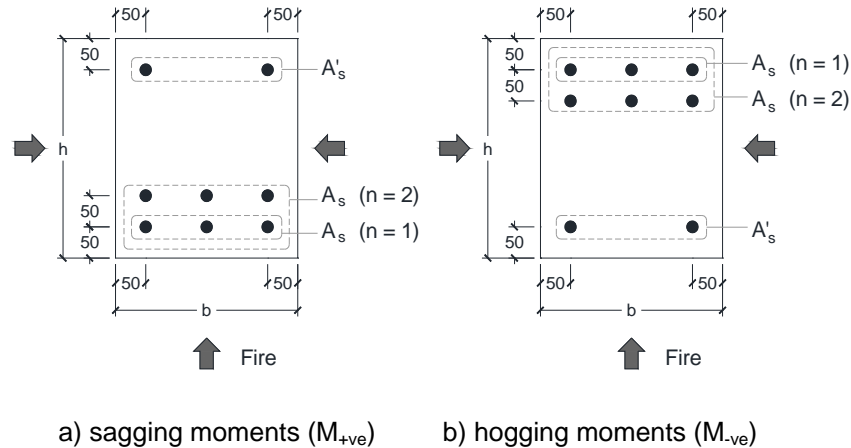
Typical cross-sections for the parametric study beams (Dimensions in mm)
